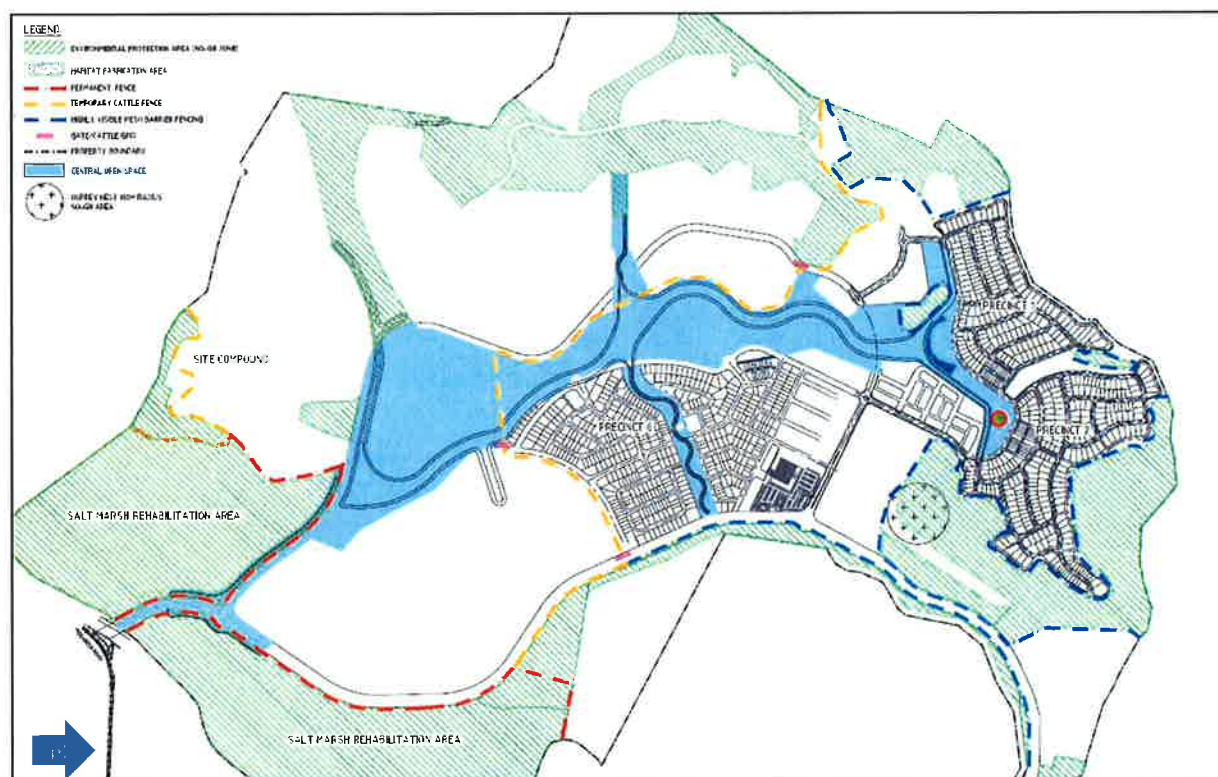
Fencing Plan extracted from original CEMP August 2012.
